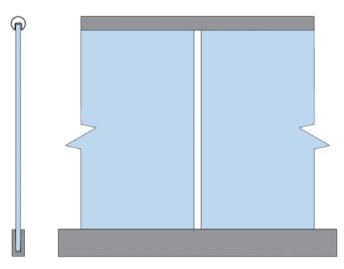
System β: Version with continuous handrail without lateral end connection of the handrail
